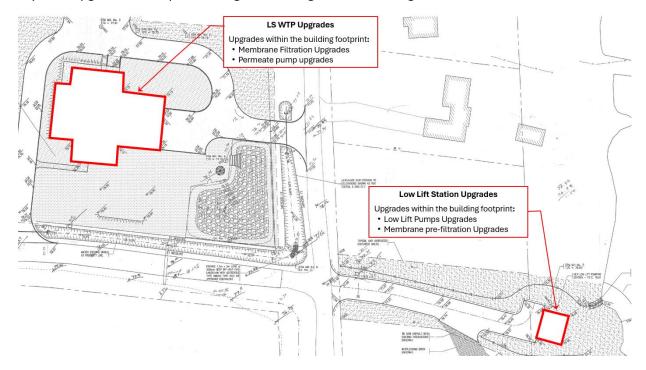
Long Sault WTP and Low lift station upgrades – Site Plan
